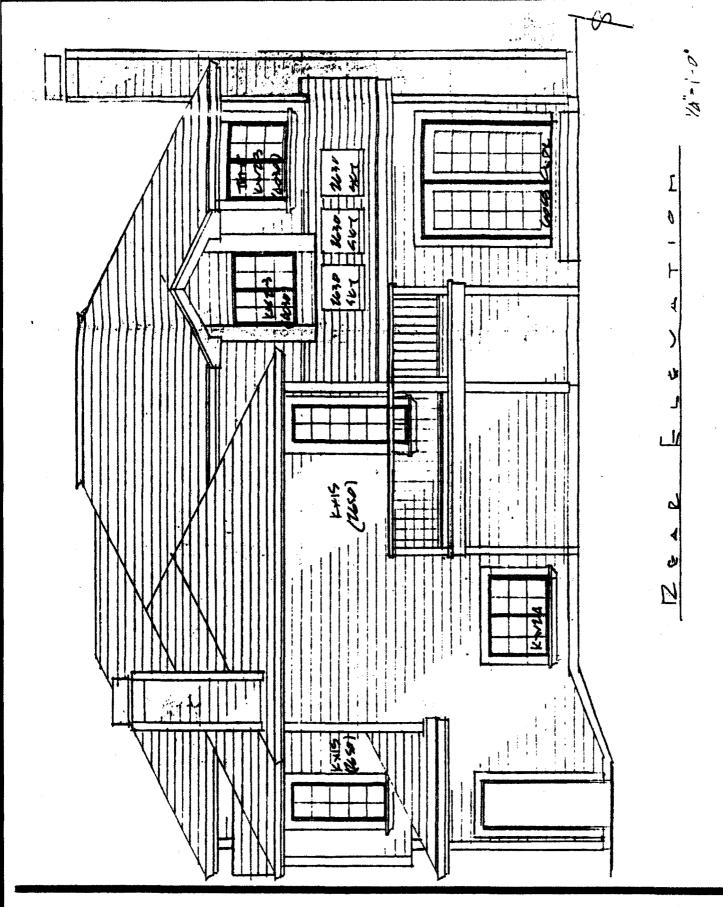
APPLICATION NO. 1-95-48 TOBY Rear Elevation
